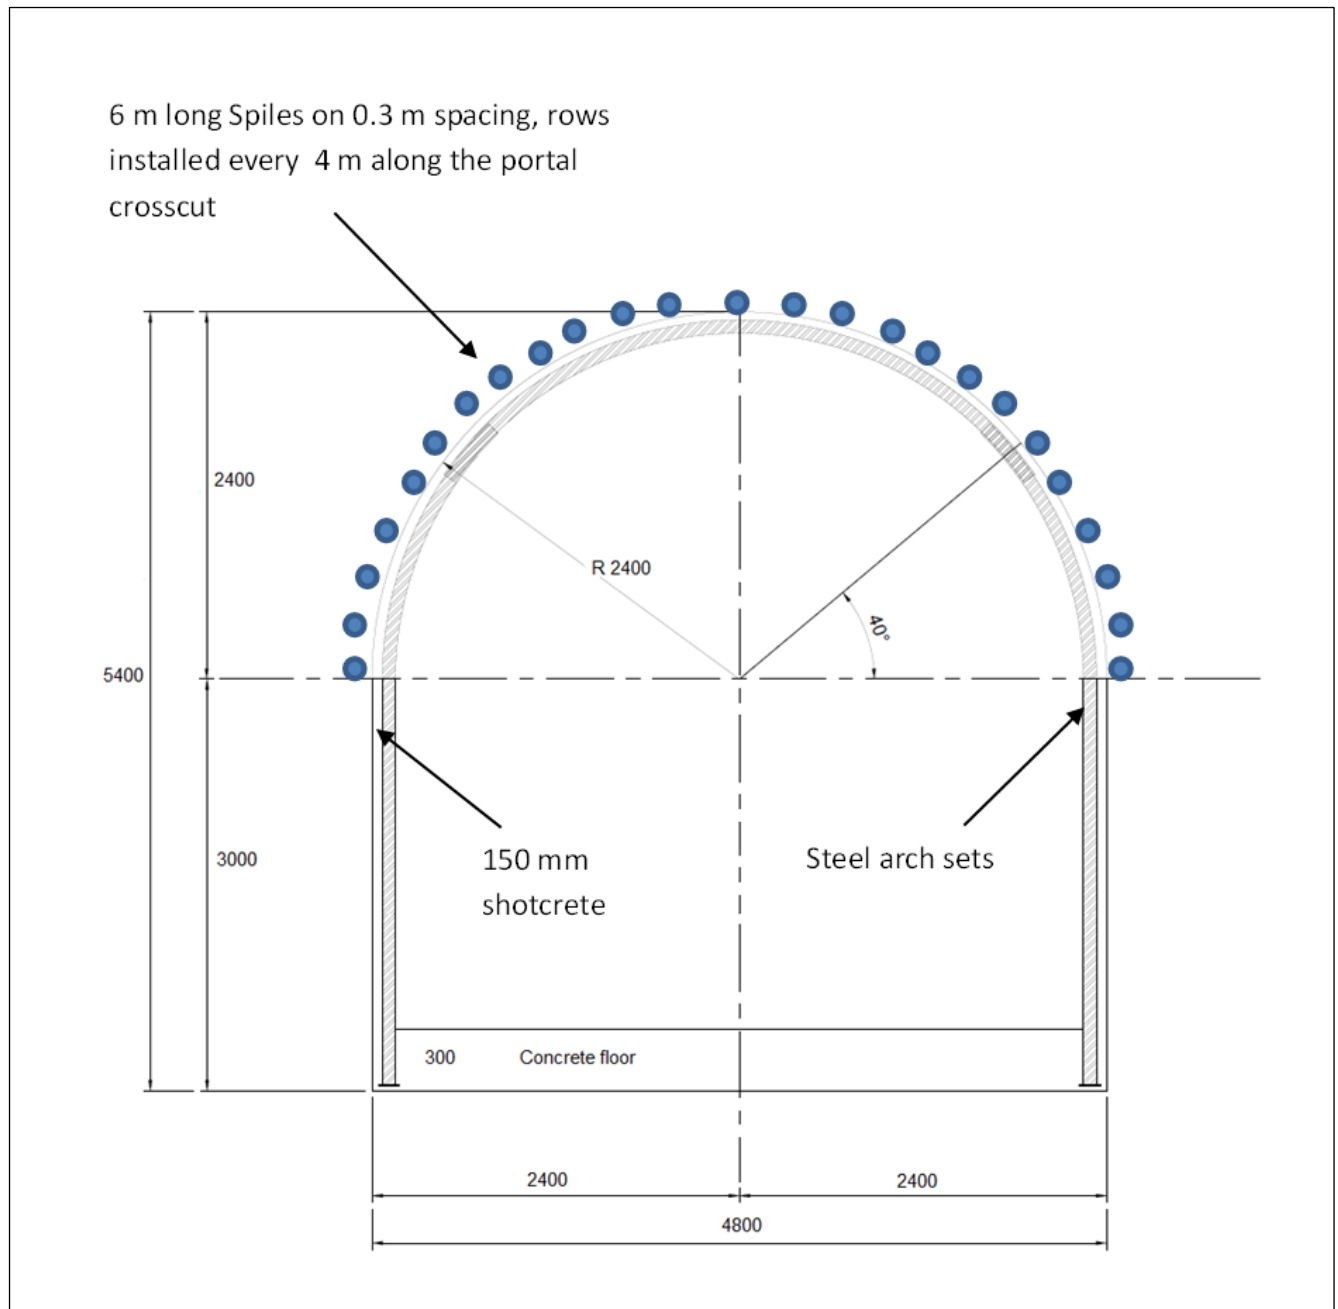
Trucking Decline Portal – Cross Section First 50m
